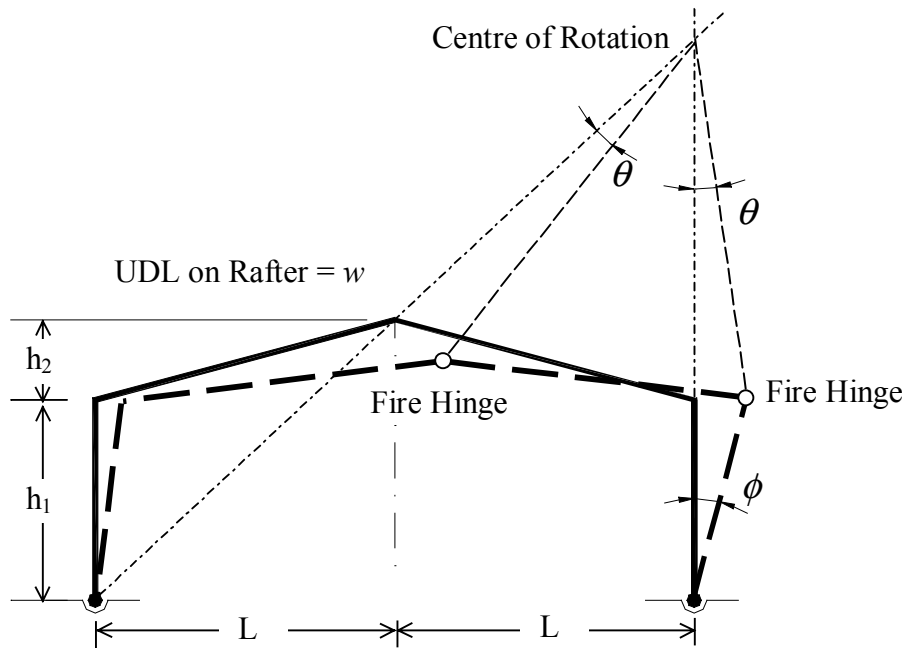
Failure mechanism and location of fire hinges – frame heated overall.
